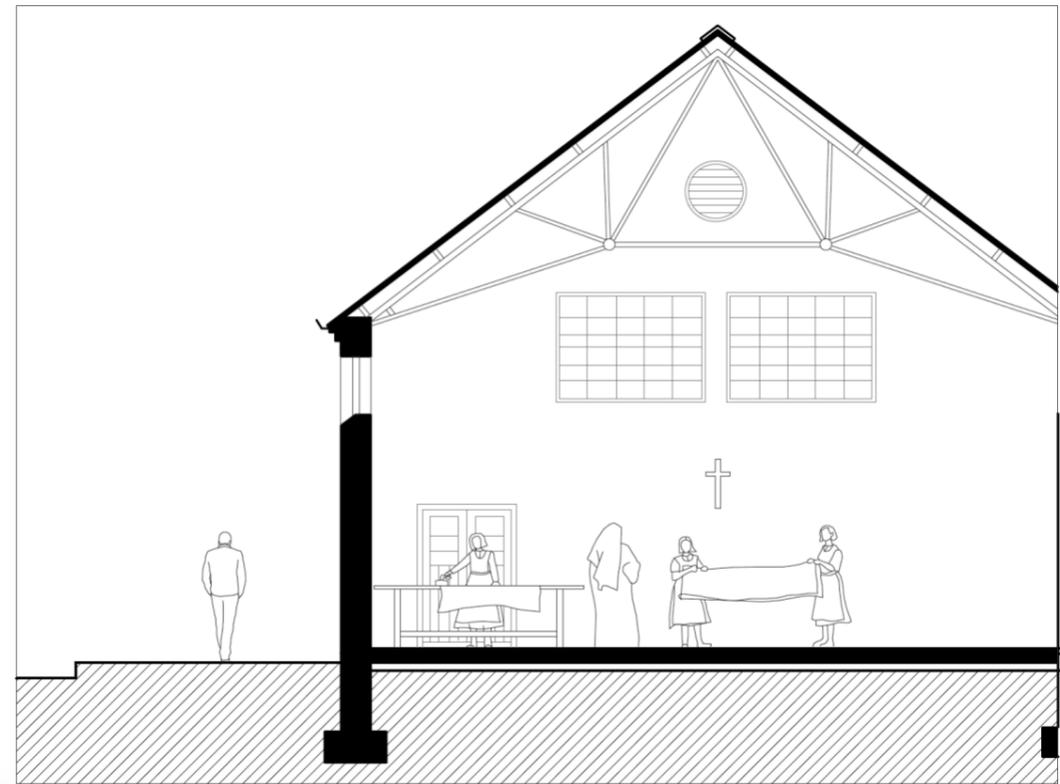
Section of Ironing Room on Railway St side(Source: Author's Own Drawing)
